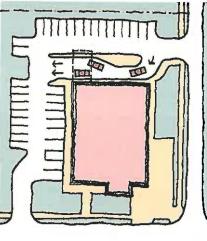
In these images, the drive-through is oriented away from the street corner, at the side or rear of the building.
